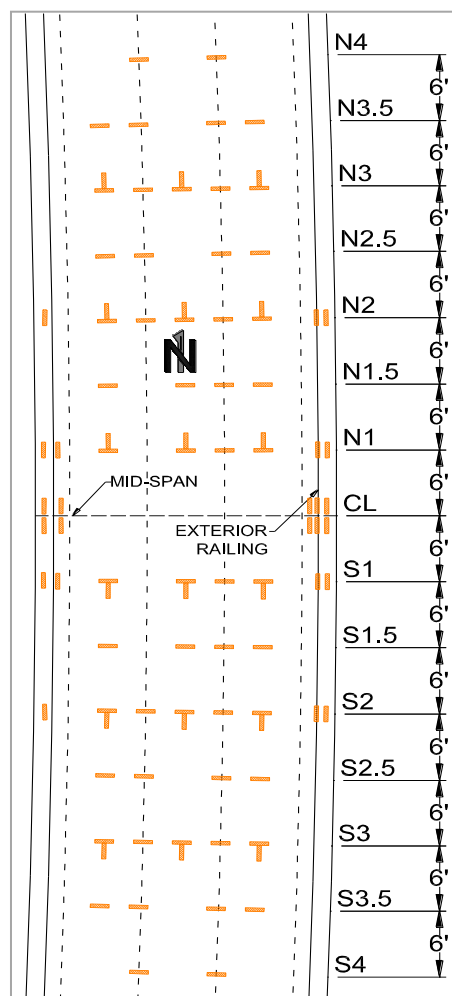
Arrangement of the concrete gages on concrete deck Test 3 [Neuman, (2009)]
